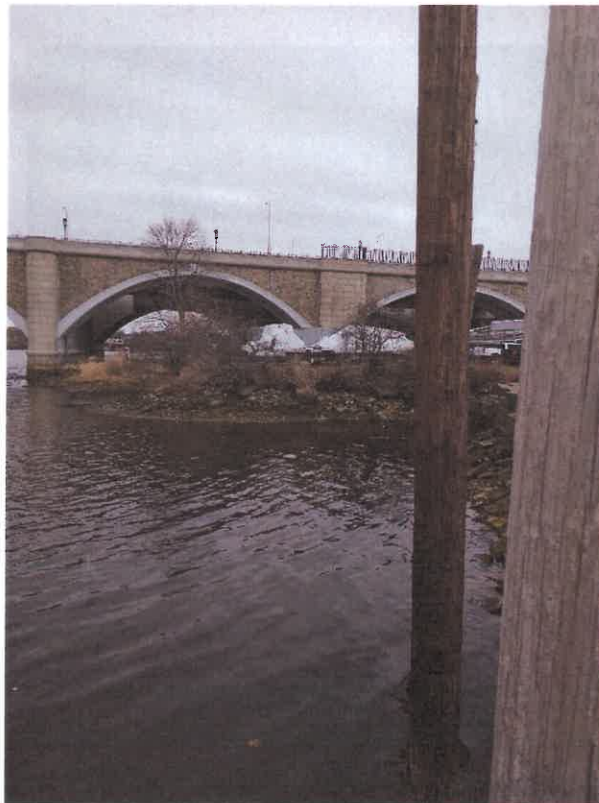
Coastal Feature #7 (Vertical stone wall) and Coastal Feature #8 (Top of bank / top of rip rap) at southeast corner of bridge. See Figure 3.
